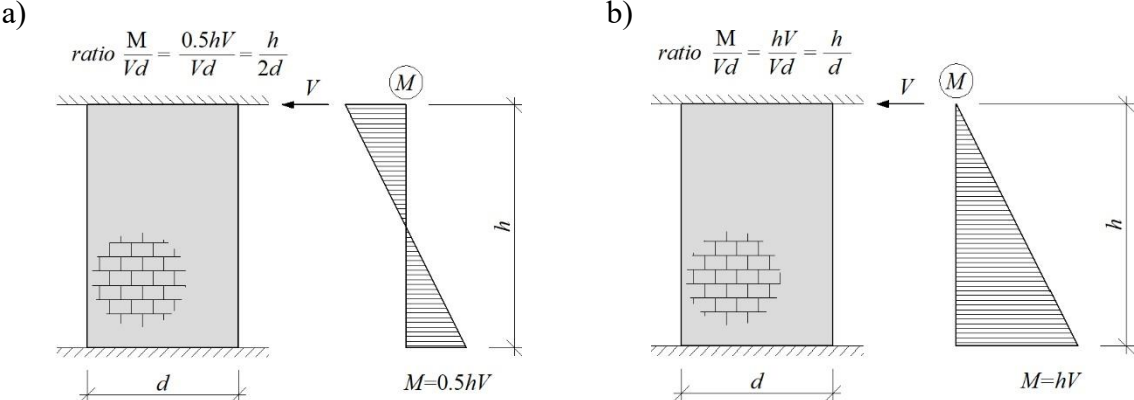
$M/Vd$  ratios and static schemes for masonry shear walls: a) stiffening wall between floors – fixed top and bottom edge, b) one story cantilever wall – fixed bottom edge:  $h$  – the height of the wall,  $d$  – the length of the wall,  $M$  – in-plane bending moment,  $V$  – horizontal force
